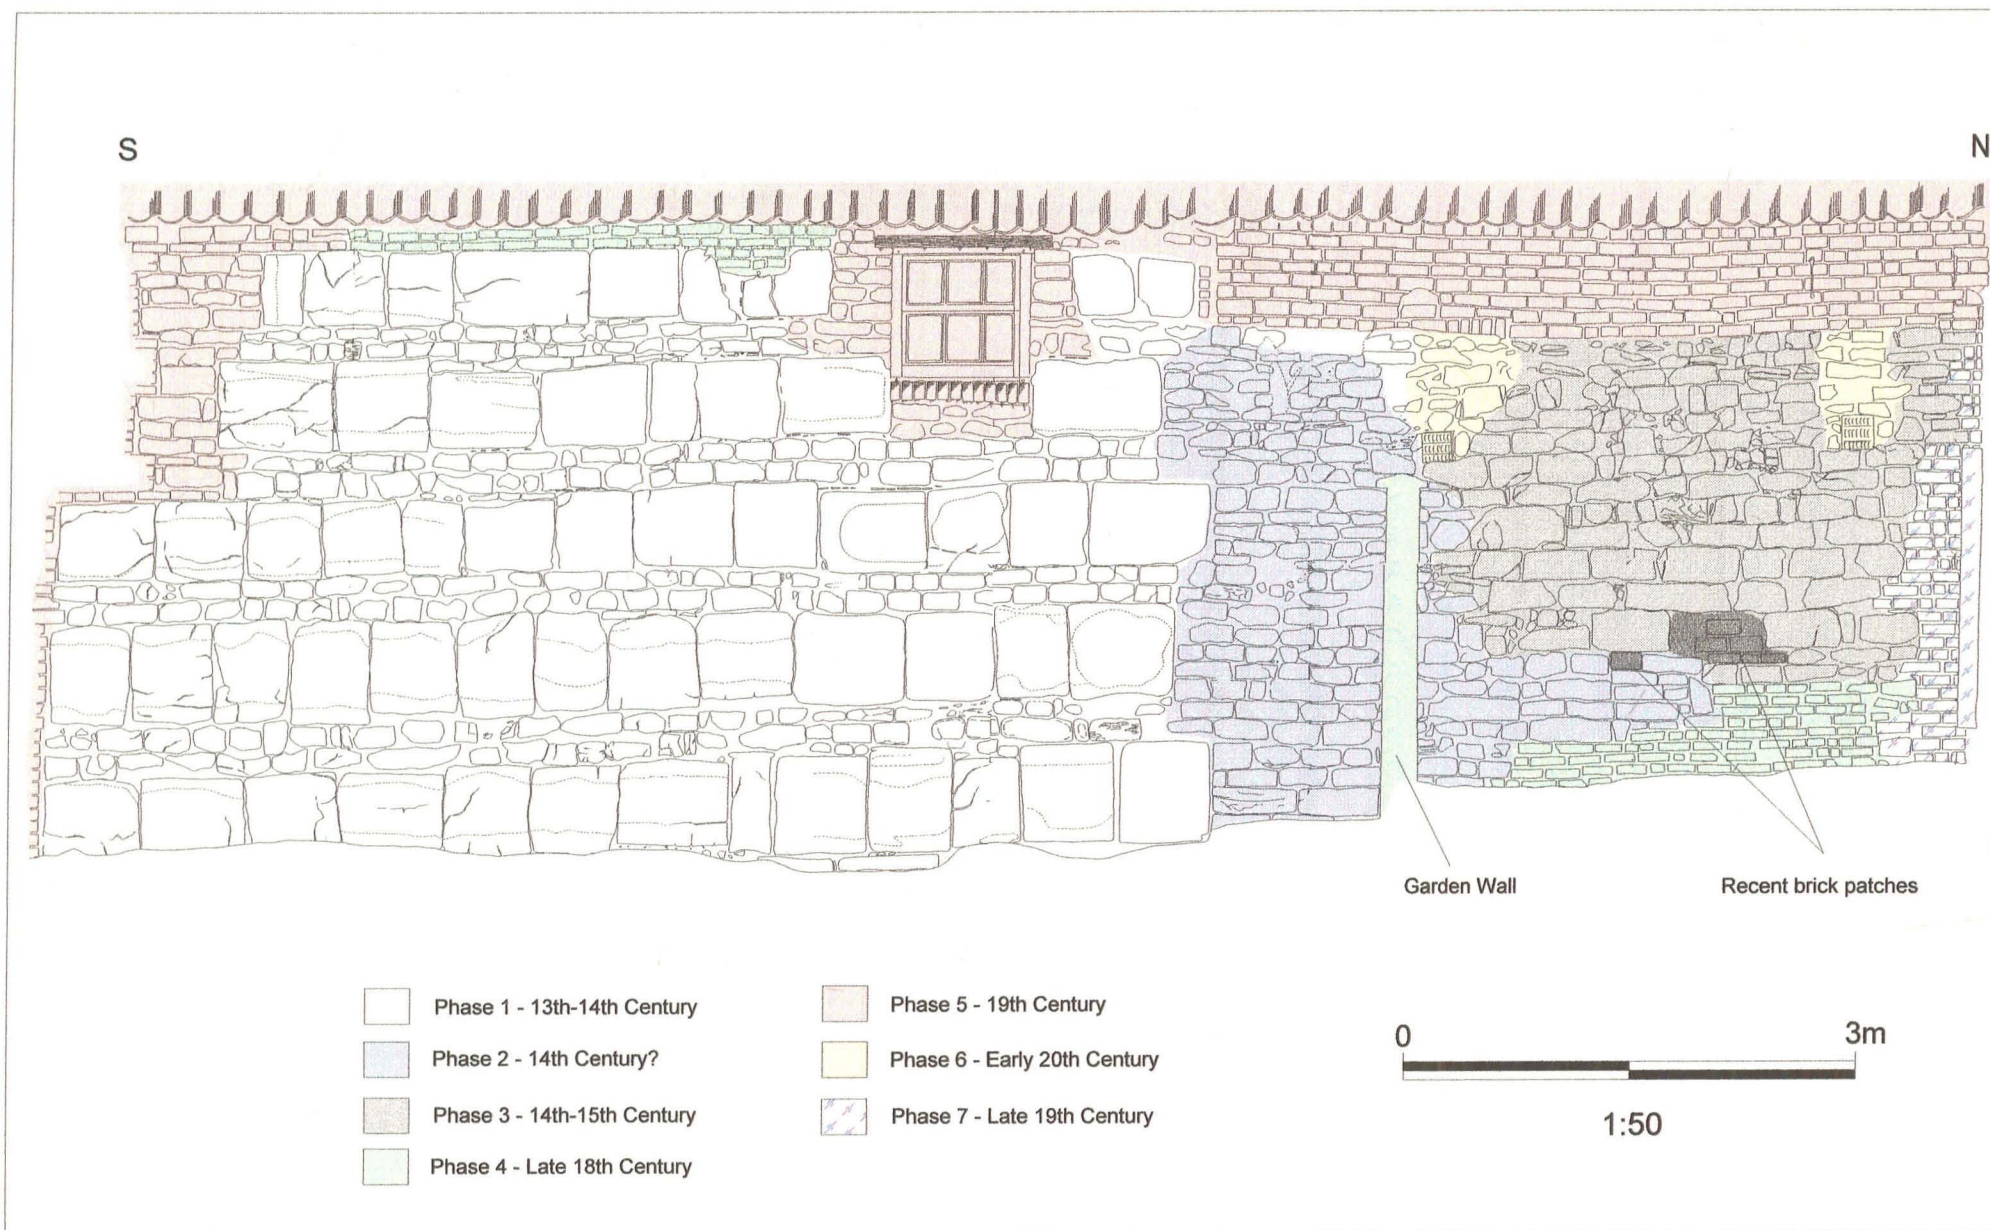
East facing elevation of the Cathedral Close Wall, Pottergate.
